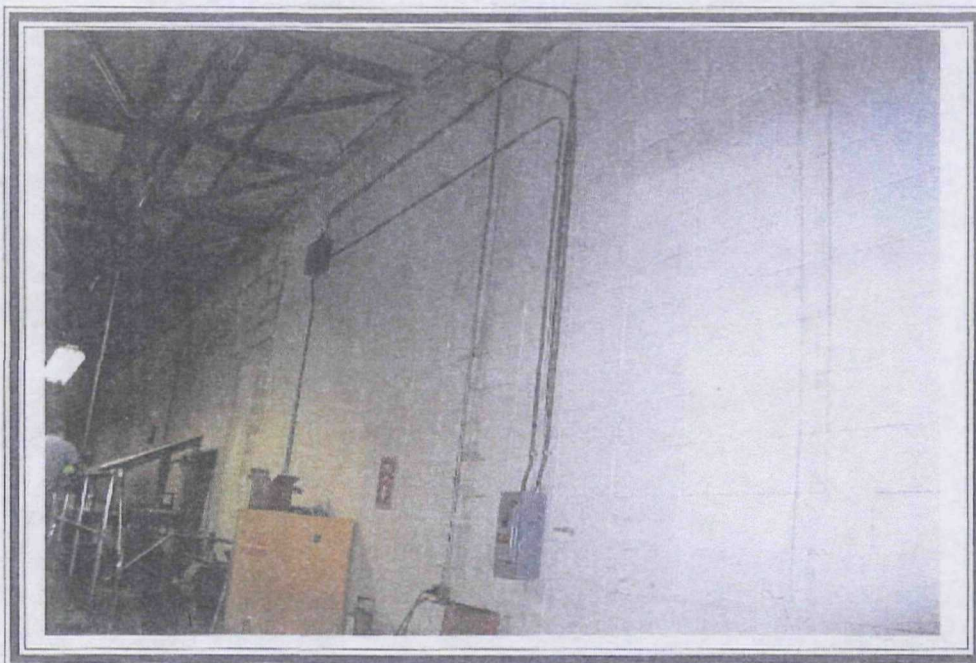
Water damage to ceiling and water staining on the east wall of the southern warehouse area.
